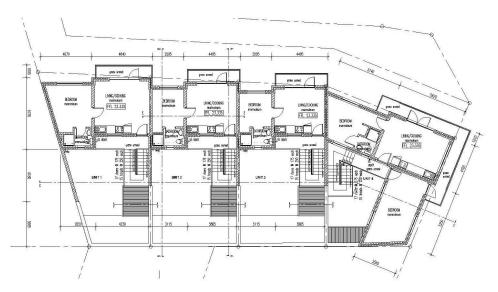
Plan of the 1st floor living space(Frehrking 2018)
